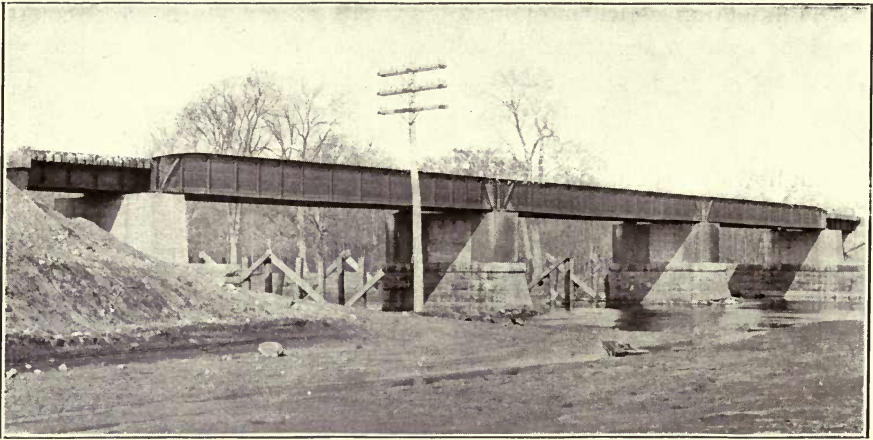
RAISING GRADE OF OLD MASONRY PIERS, C., M. & ST. P. RY.
